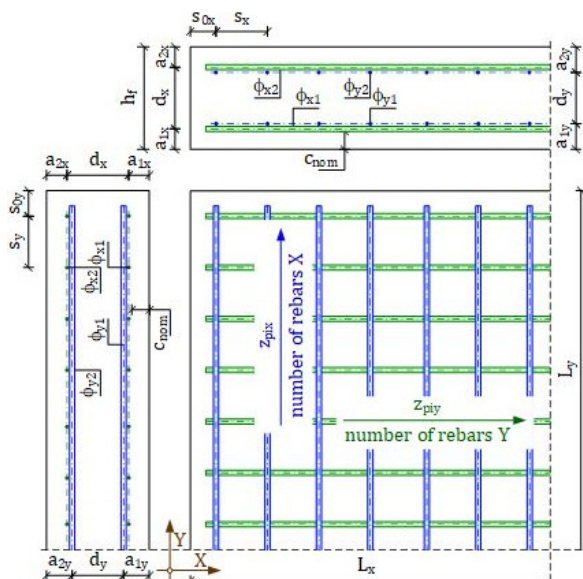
Graph of reinforcement of concrete slabs analysed using numerical models
